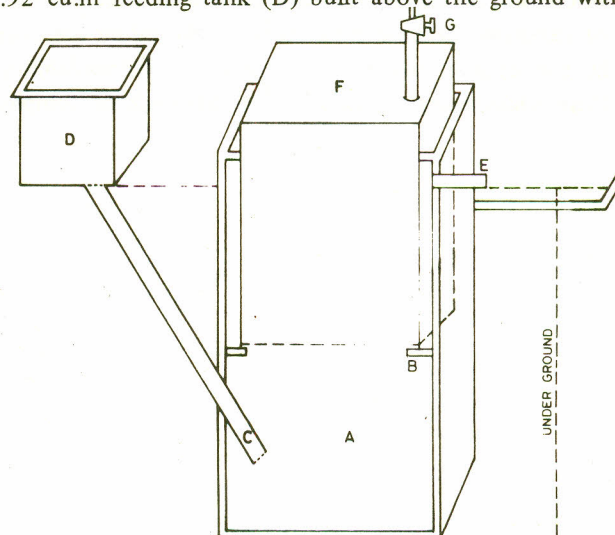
Design of biogas plant. (A. Tank for fermentation of slurry; B. Angle iron fixed in the wall of tank for supporting gas holder; C. Concrete pipe inlet; D. Tank for mixing water in gober; E. Concrete pipe out-let; F. Steel drum collecting bio-gas. G. Gas volve).
